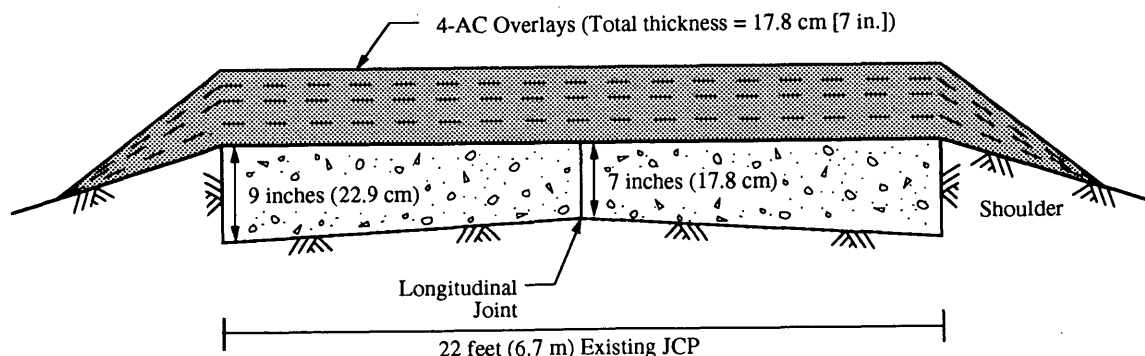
Typical cross section of existing 9-7-9 JCP.
